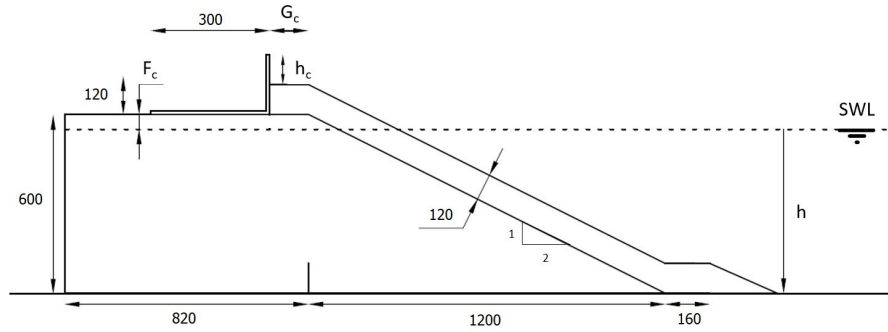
Cross section of breakwater and crown wall model with relevant parameters (in mm).
